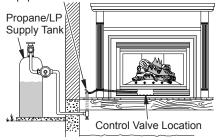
Checking Gas Joints (Propane/LP Gas Only)
